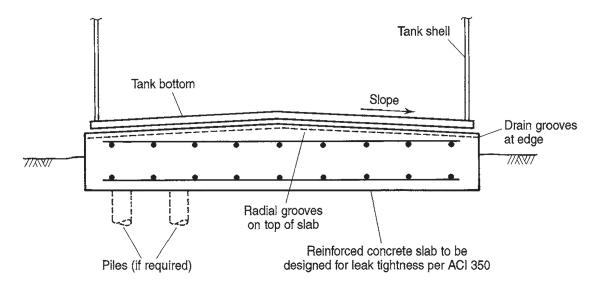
Reinforced concrete slab with radial grooves for leak detection (from API, 2005)
